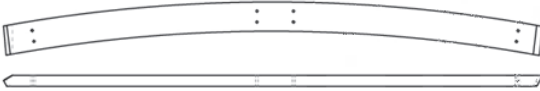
Floor plan and sections of the lamella vault of the physical model.
